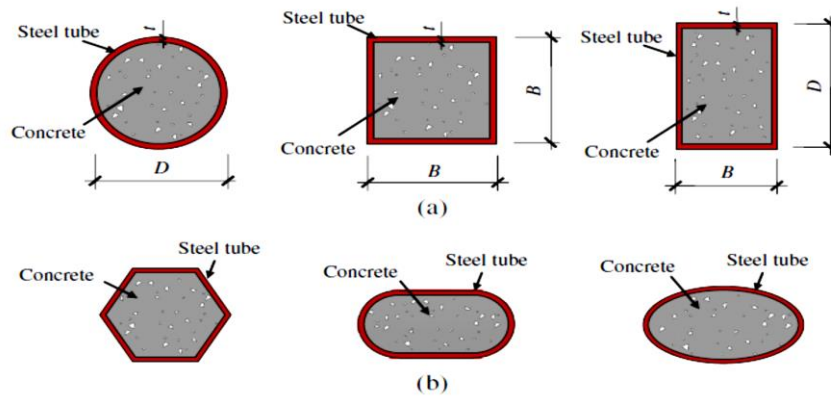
Typical concrete-filled steel tubular sections (Han et al., 2014)
